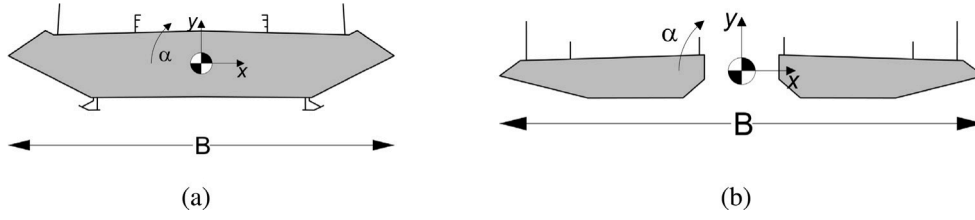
Geometry of the deck sections used for the nonlinear model: (a) Hardanger Bridge and (b) twin-box deck section.
